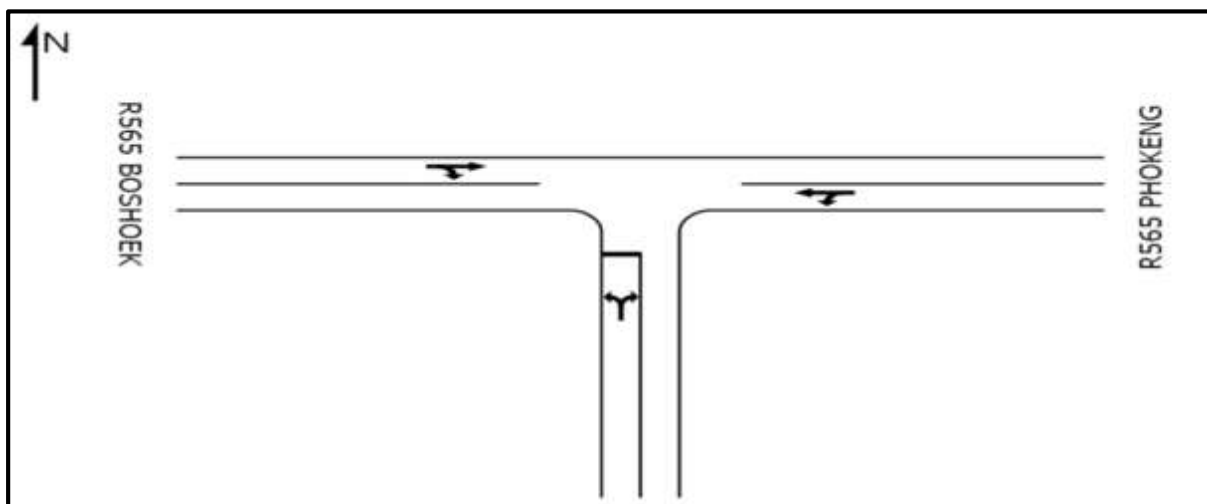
R565 & Gravel Road- Existing intersection A Layout
